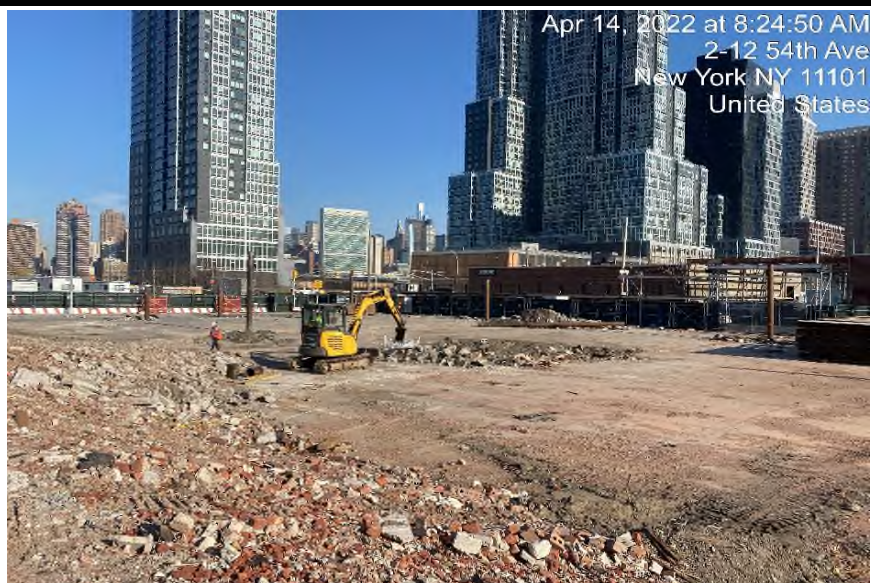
Civetta continues breaking up portions of the slab of the former building, facing north.
